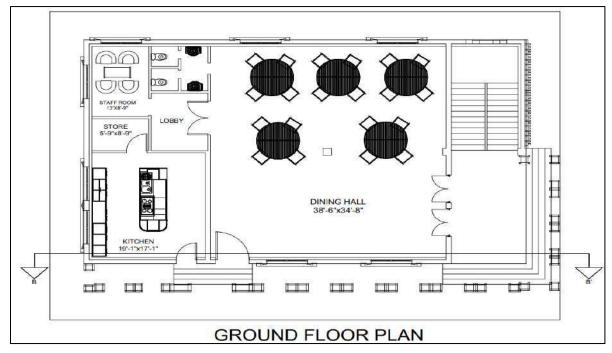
Hostel top view - Ground floor (AutoCad 2022)
